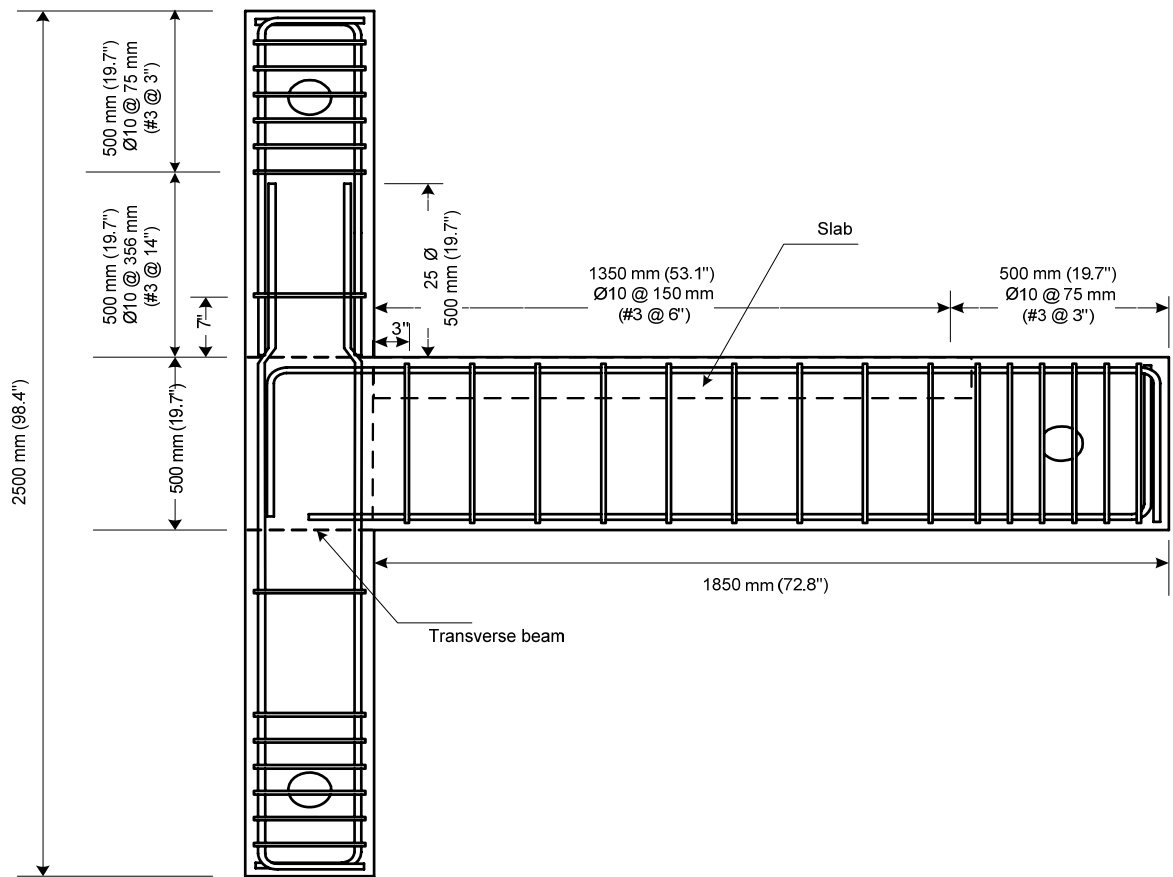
Reinforcement details of US3-ES Specimens (Side view)
